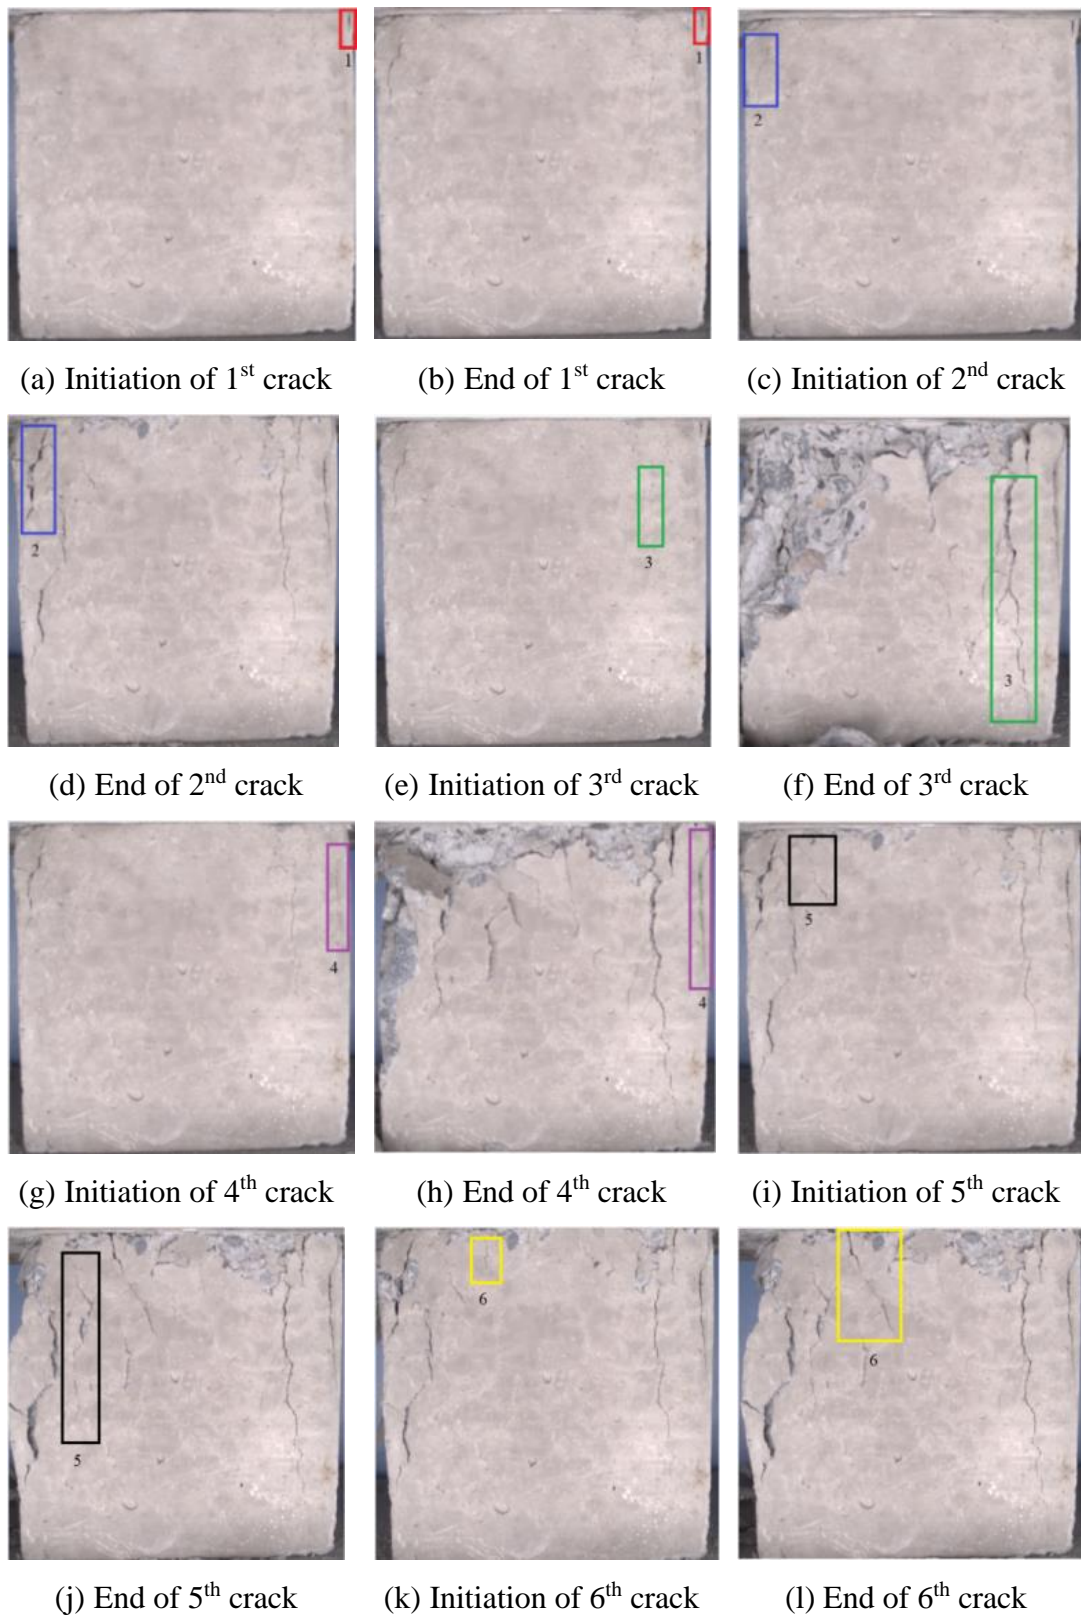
Concrete cube-A images showing the initial crack and final crack.
